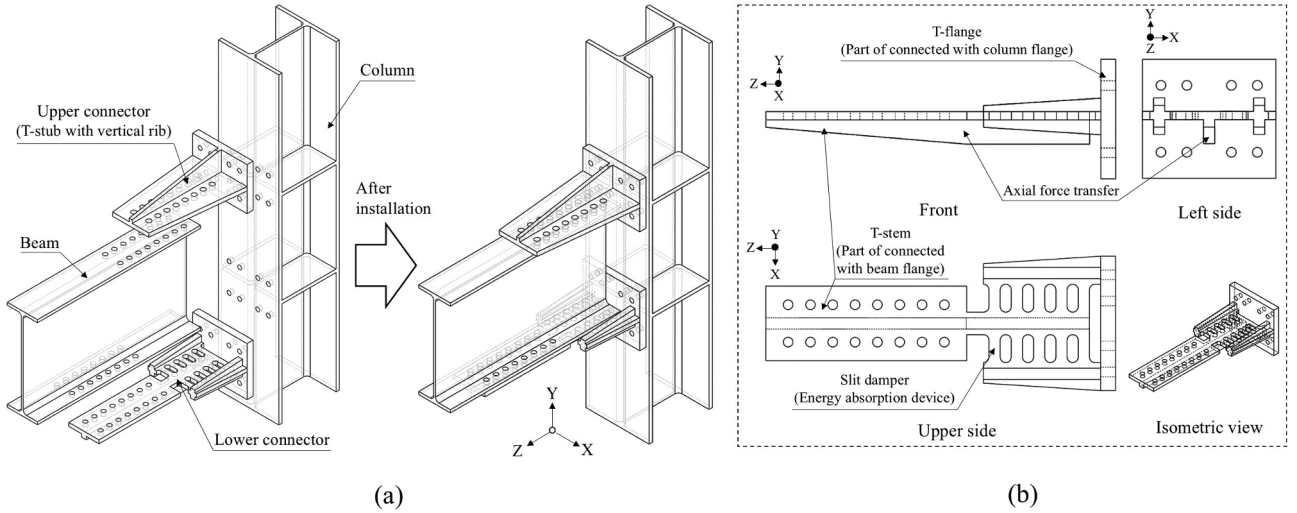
Proposed connection detail: (a) whole shape and (b) lower connector detail.
